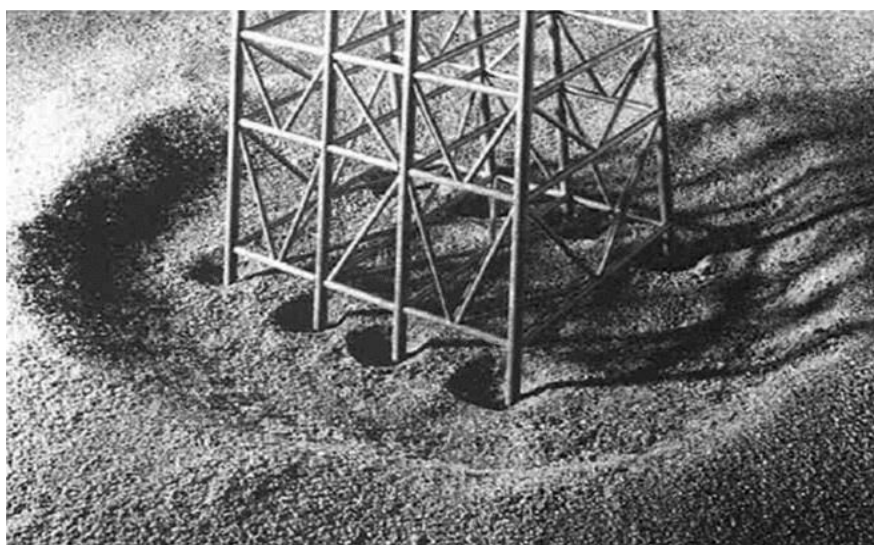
Global and local scour at a jacket type foundation (Whitehouse, 1998).
